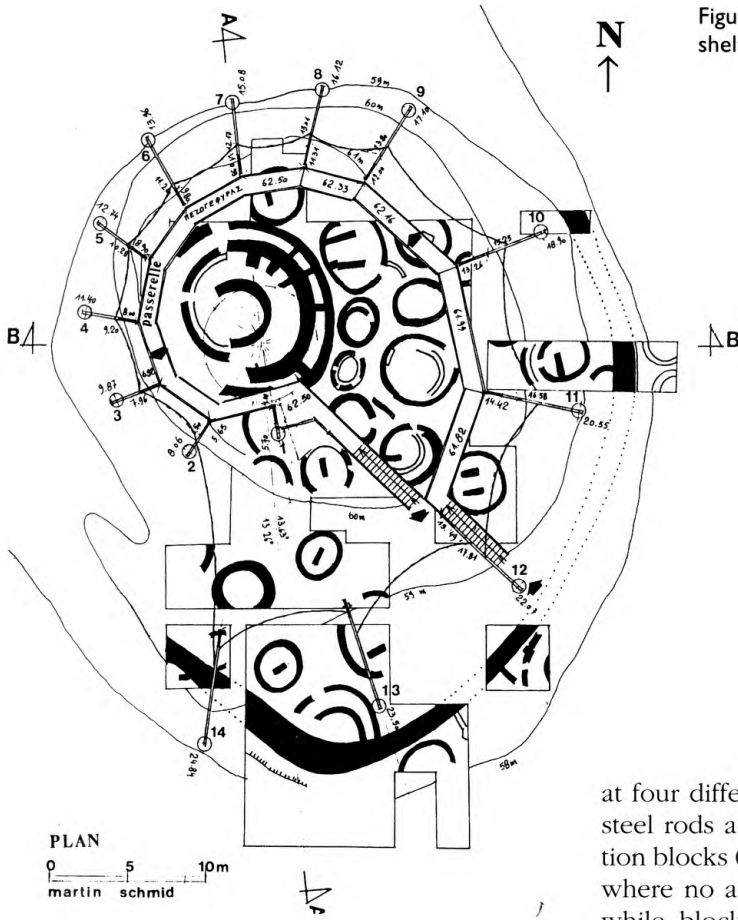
Kalavassos-Tenta: plan of the new shelter.
